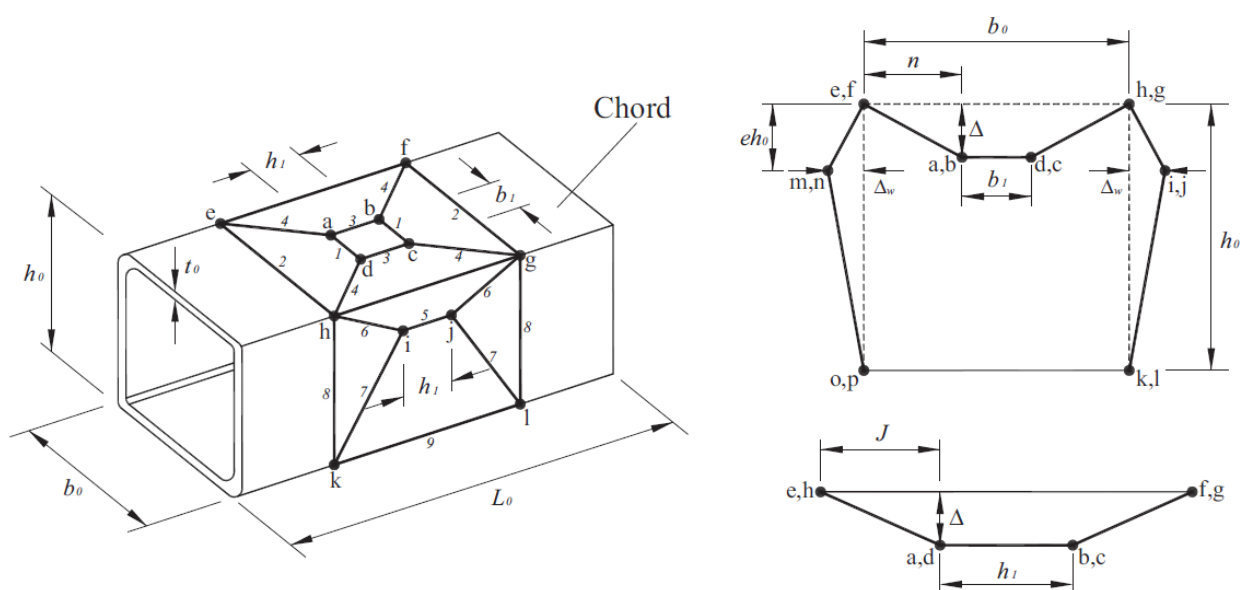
Membrane mechanism model for welded tubular T-joint by Zhao and Hancock (1991) [157]
